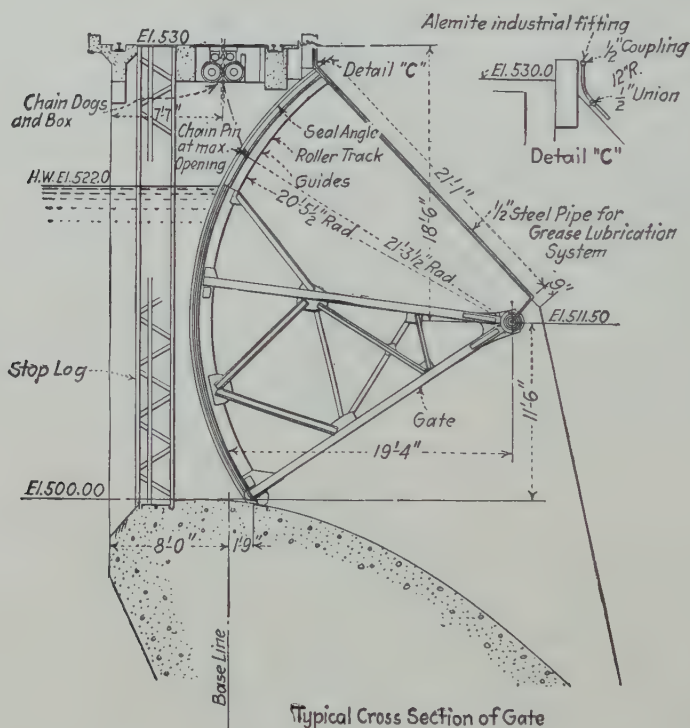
Tainter gates at Bartlett's Ferry plant.
